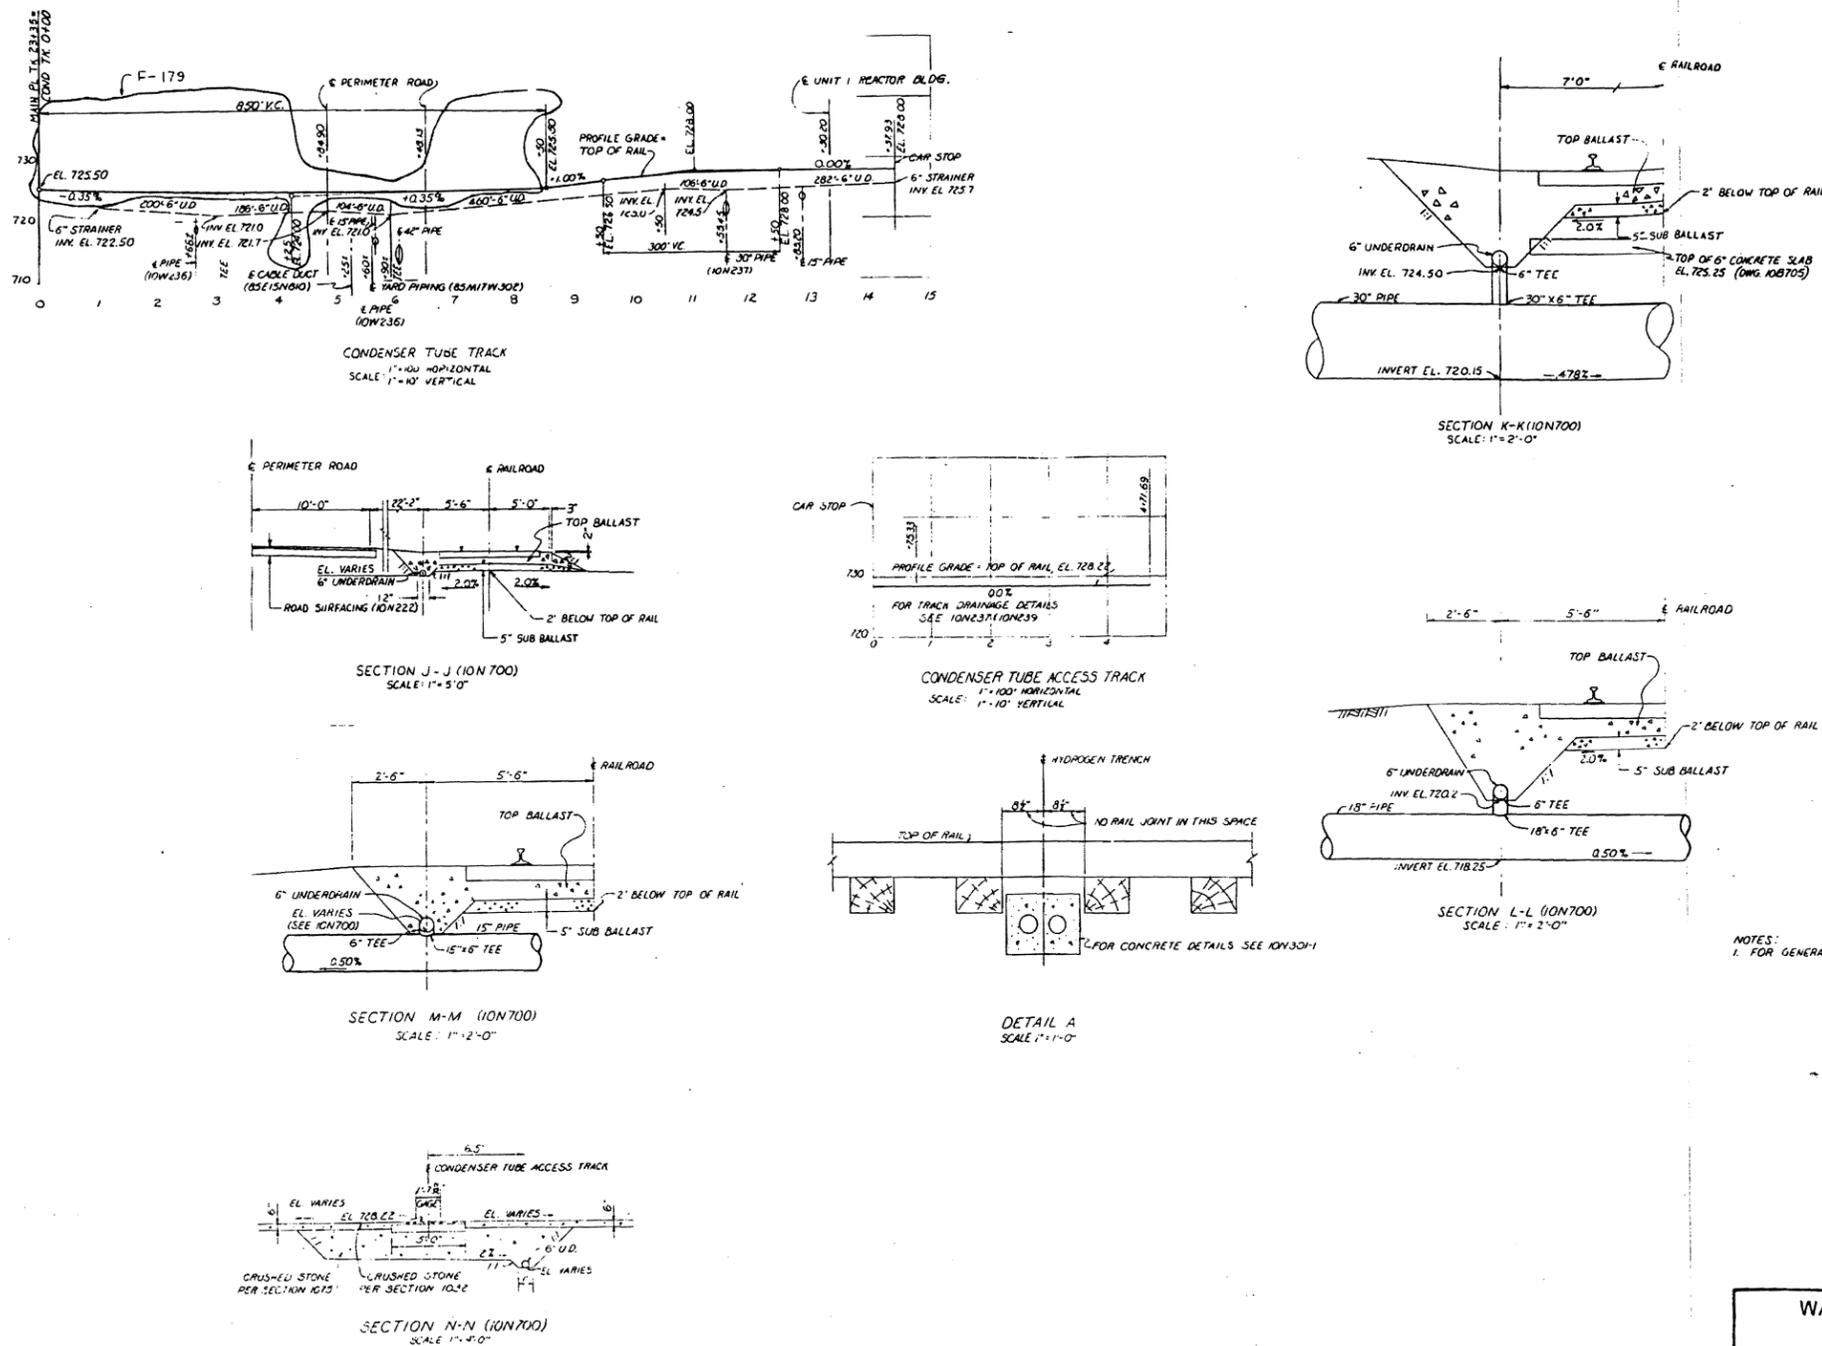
Main Plant Main Plant Tracks Sections & Profiles - Sheet 2
